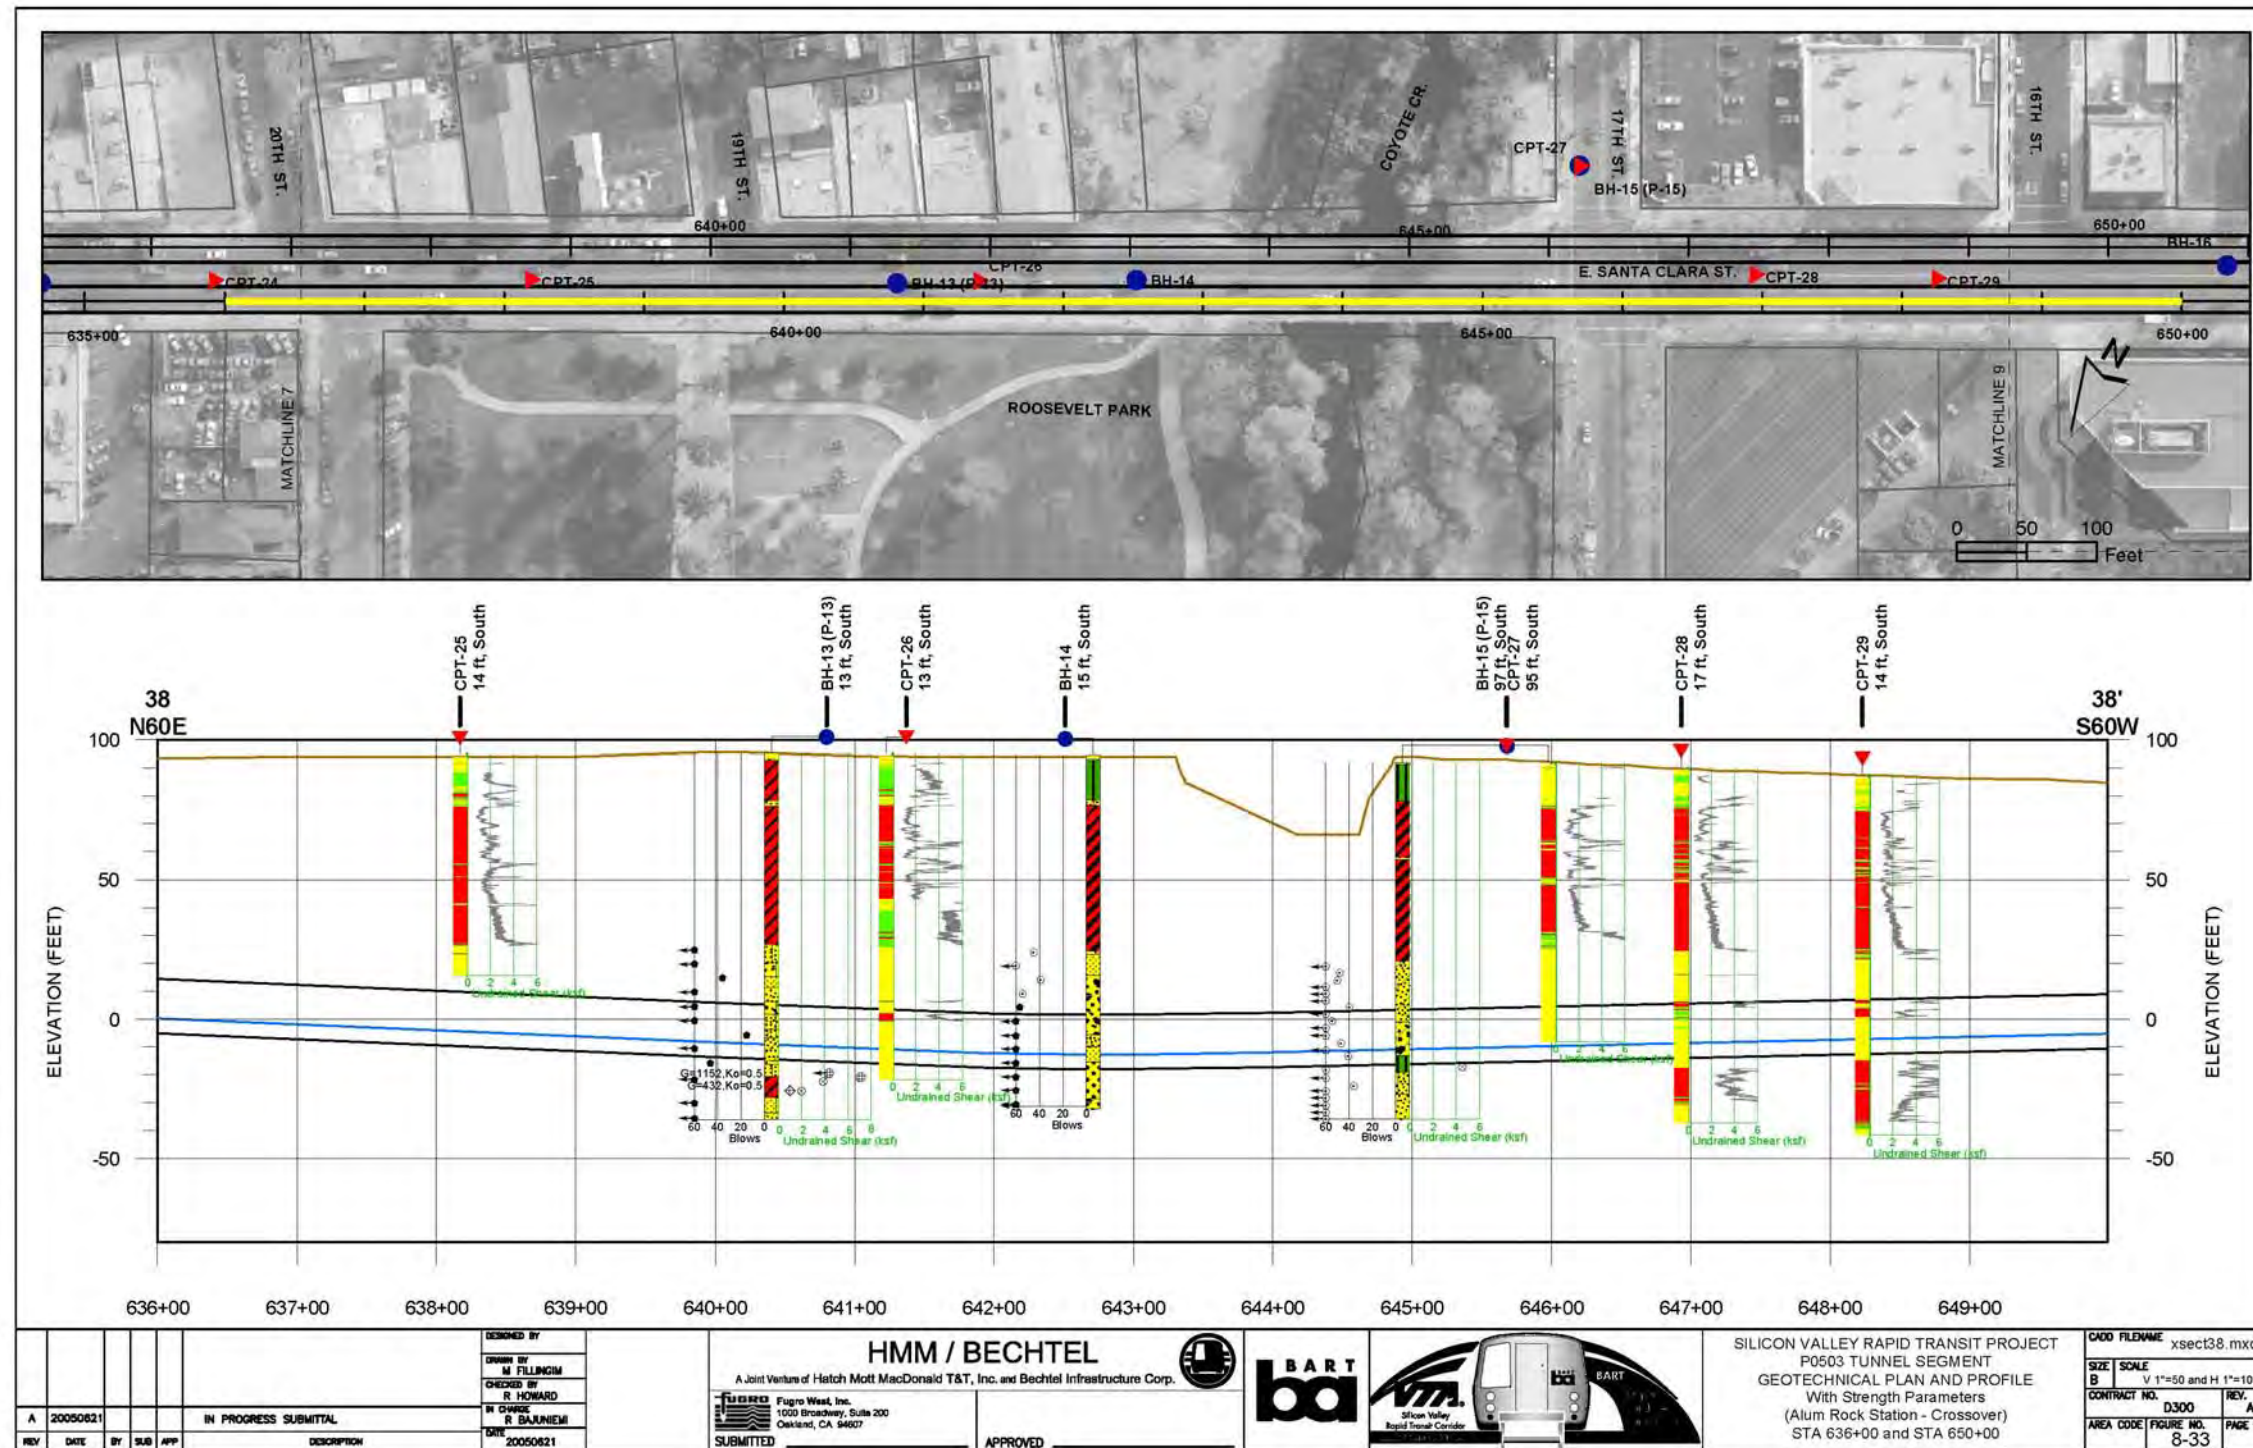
Geotechnical Plan and Profile with Strength Parameters: 636+00 to 650+00.
